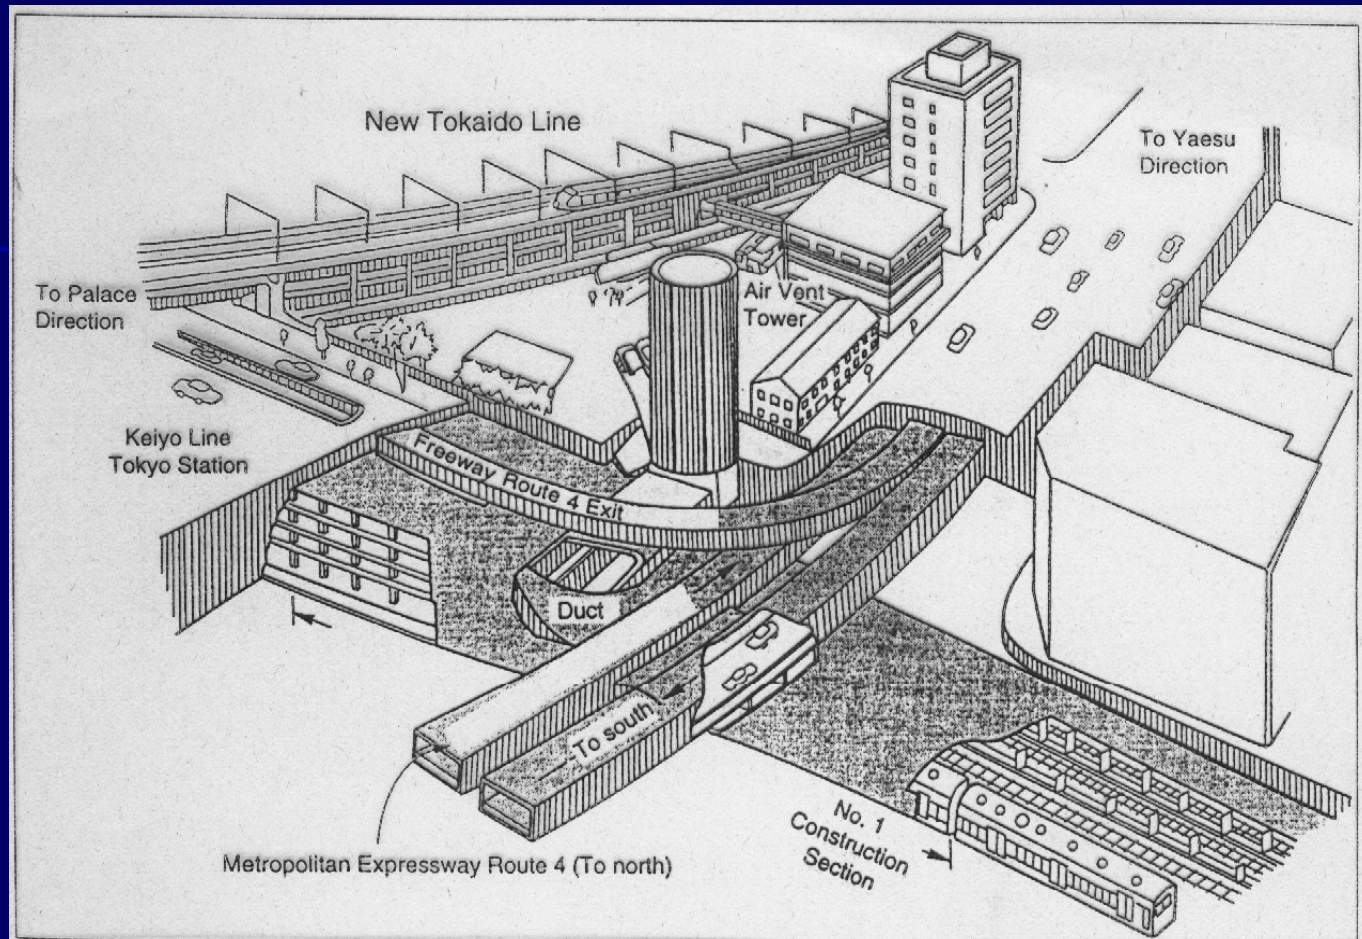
Intricate Underground Facilities Near the Keiyo Line Tokyo Station
